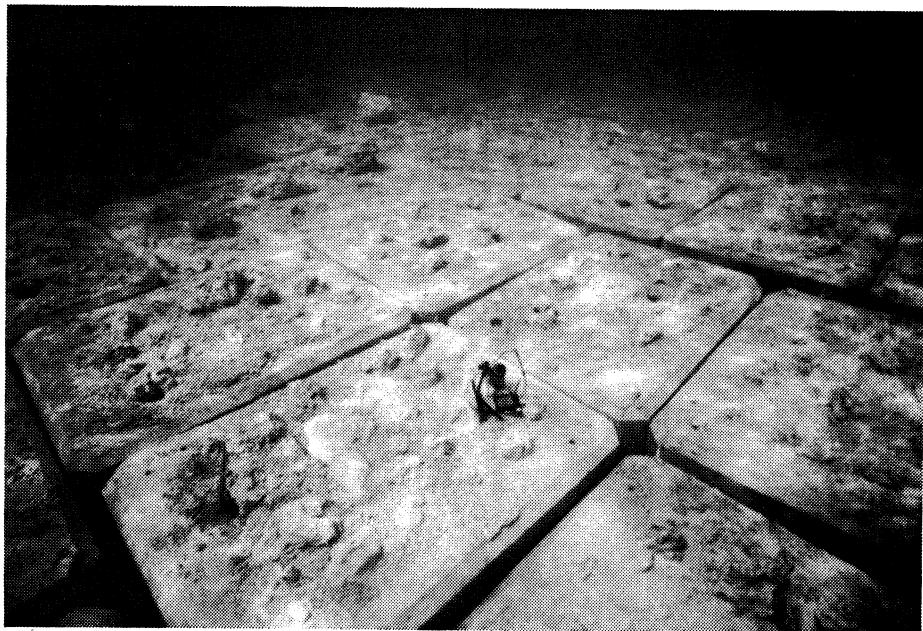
View of a section of the reef repair work prior to application of tremie concrete.
